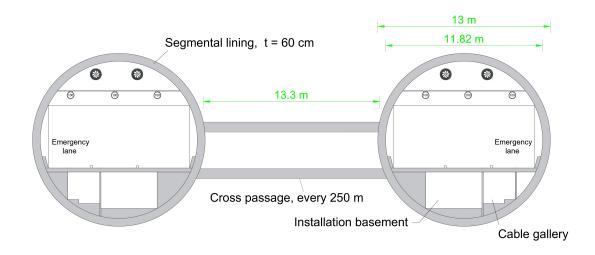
Cross section of double-tube bored tunnels with emergency lane
